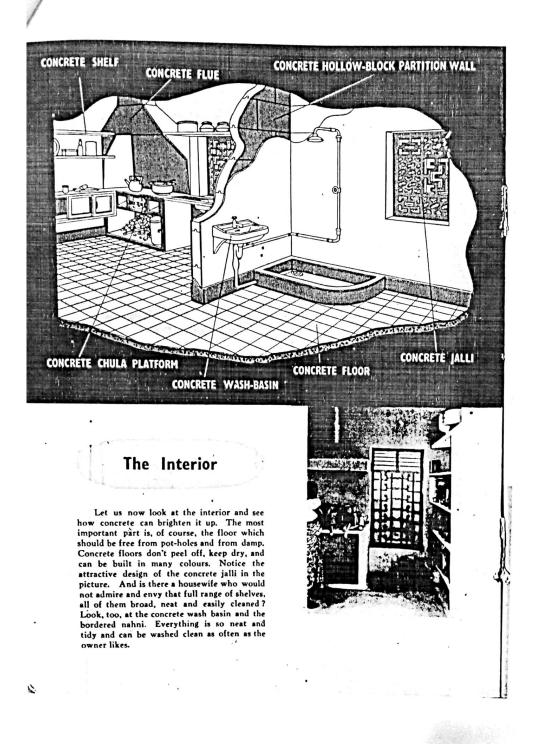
Spread detailing the multiple applications of concrete to furnish the interiors of the rural home. From *Our Villages of Tomorrow*.
